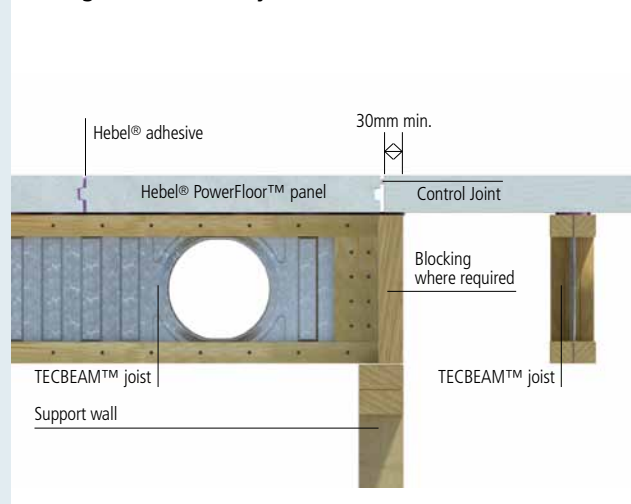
Control Joint over Bearer/Support Wall
